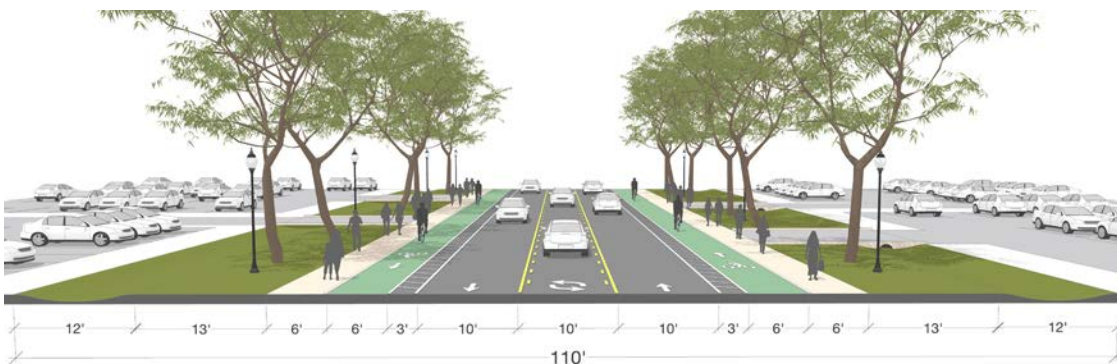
East Harding Avenue from Ohio Street to I-530 by Restriping
